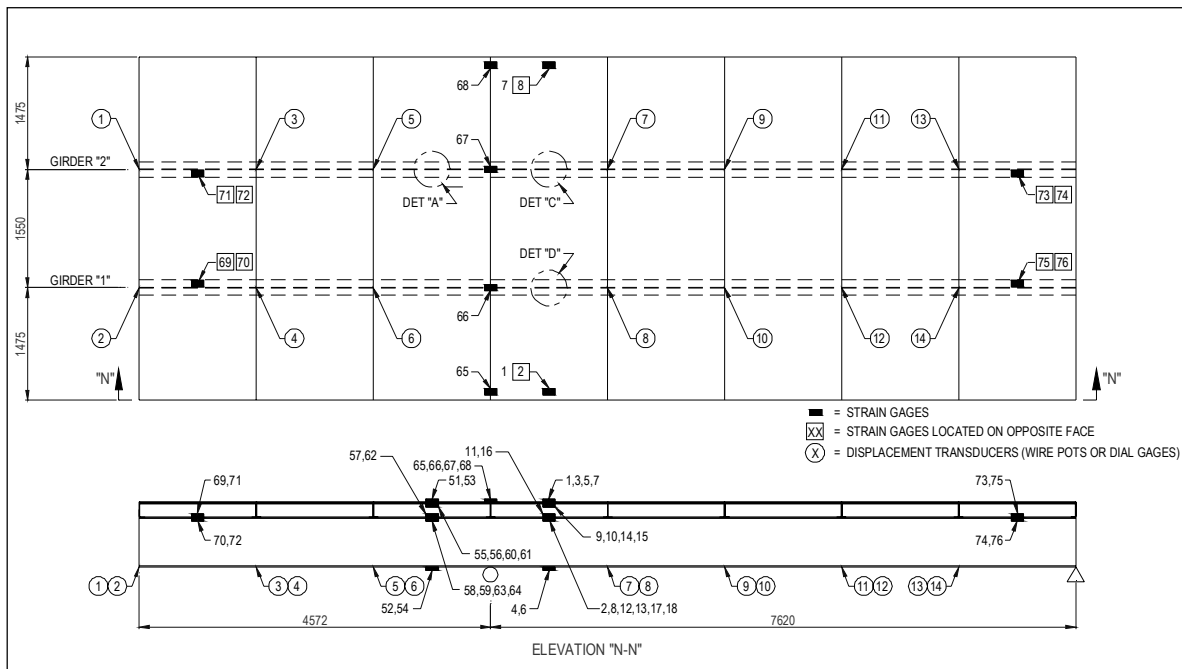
INSTRUMENTATION LAYOUT FOR LOAD CASE C3
